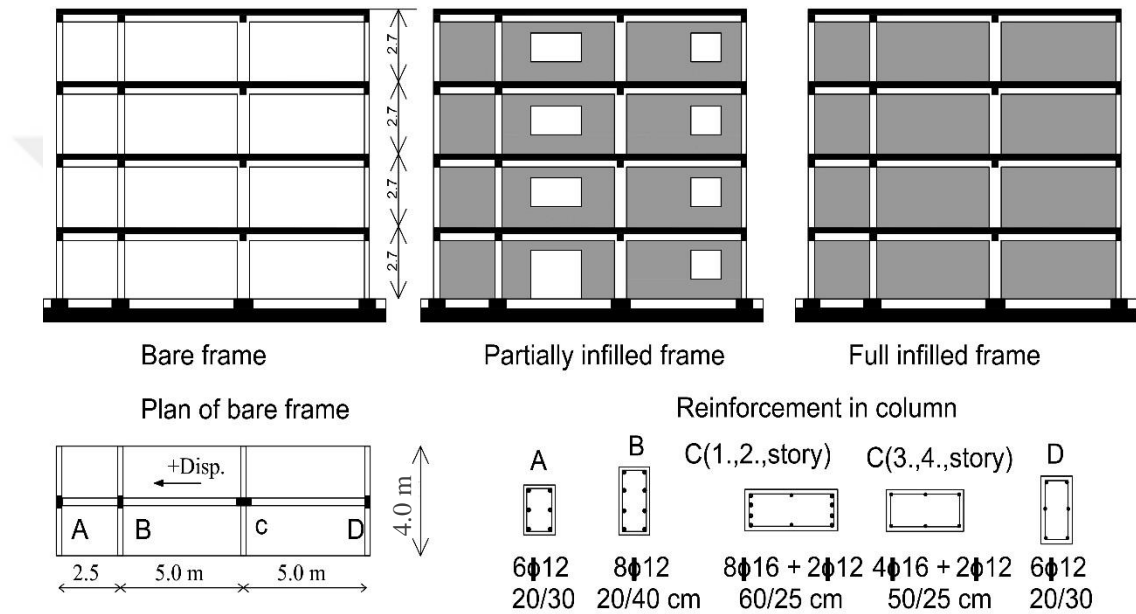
Layout of the frames and reinforcement details of the columns (Dolšek and Fajfar, 2008)
